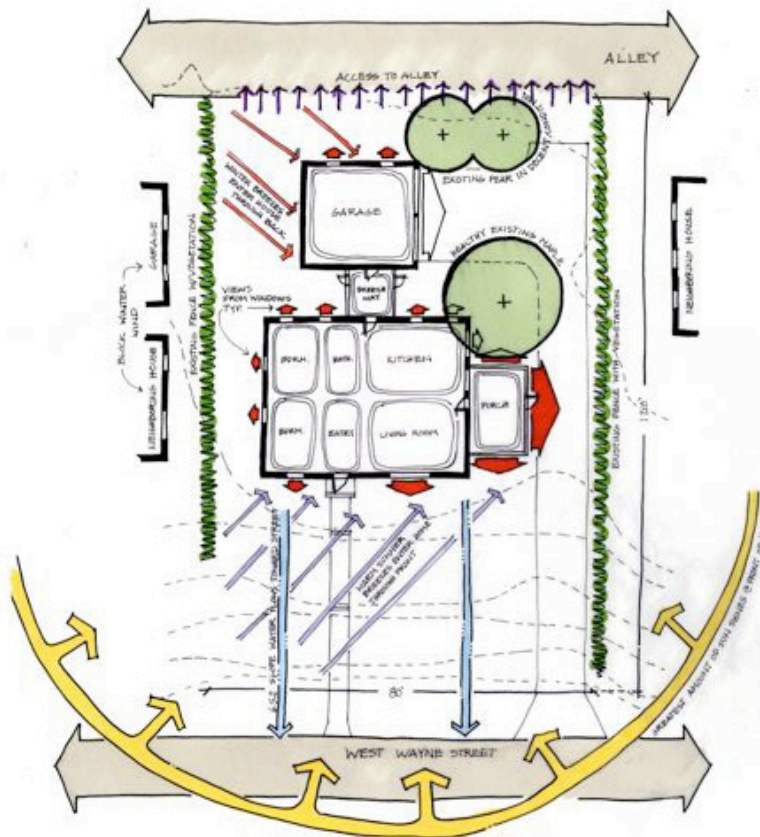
Existing plan of 1006 Wayne Street Muncie, Indiana. Most of the yard is grass and driveway with minimal planting beds and a few mature trees. The existing house is in good shape as well as the sugar maple tree which is located in the northeast quadrant of the lot, these elements will serve as the base for all three designs. {Drawing: Vanessa Gilbert}
